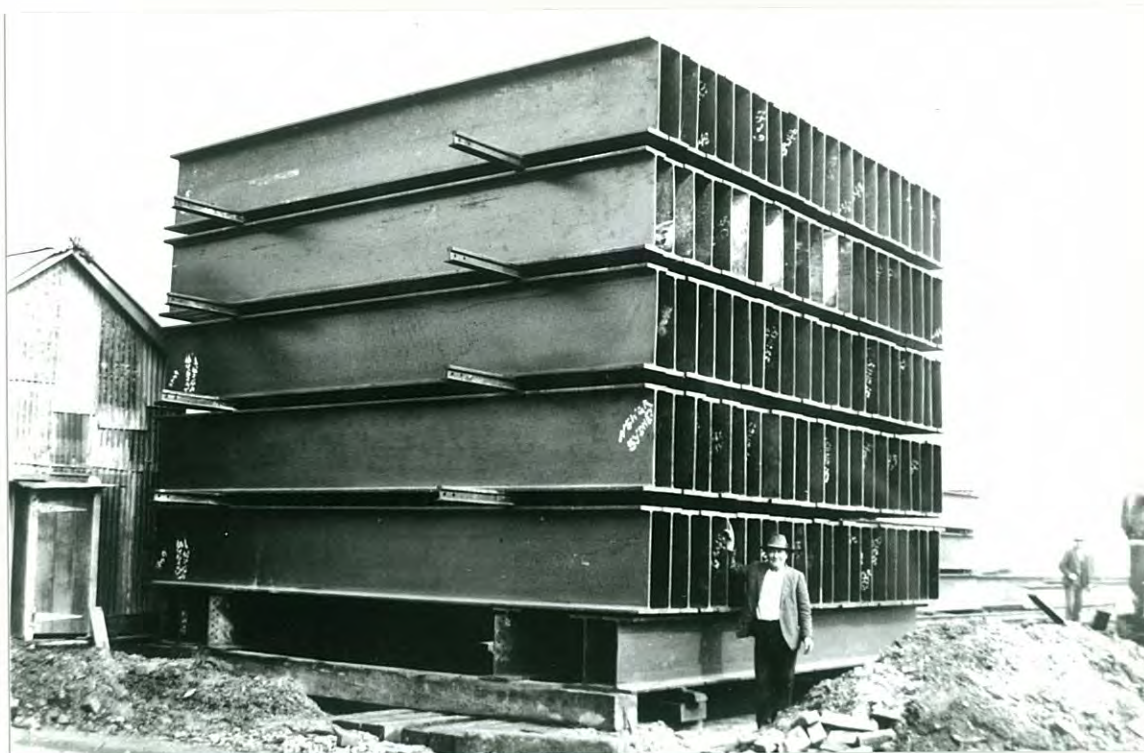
The Town Hall to Central section also required extensive underpinning of city building foundations using a large quantity of imported broad flange beams.
